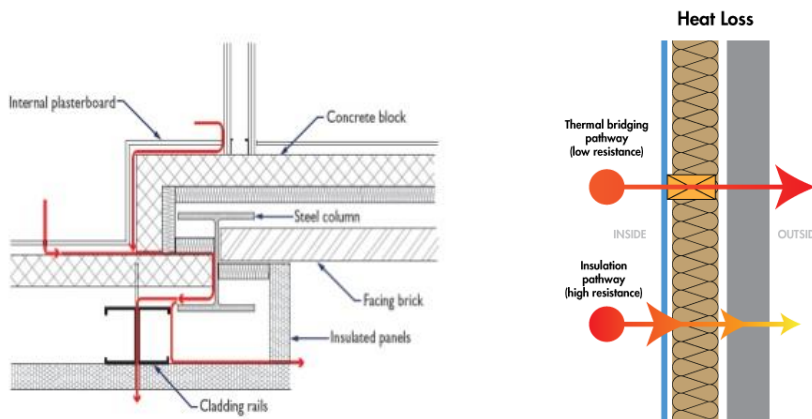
Exemplar continuous airtightness line of building details (left) and thermal bridging principle (right)
